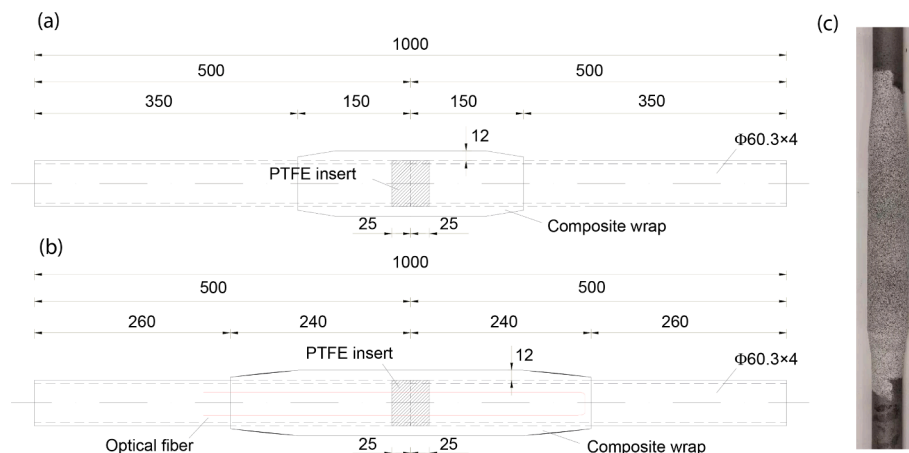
Geometry and dimensions of specimens (a) static specimen; (b) fatigue specimen; (c) fatigue specimen with DIC pattern.
